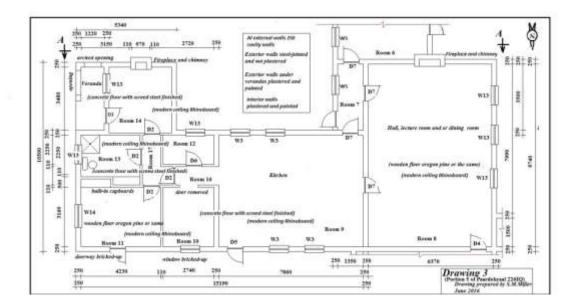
Above. Layout of rooms 7 to 14. (Drawing S.M. Miller 2016.)
